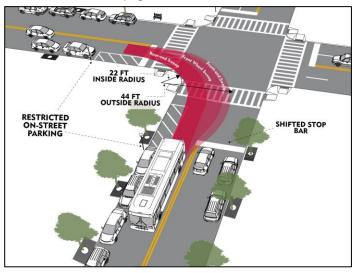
40 ft. bus turning at intersection with shifted stop bar at Howard Street & 27th Street in Remington
